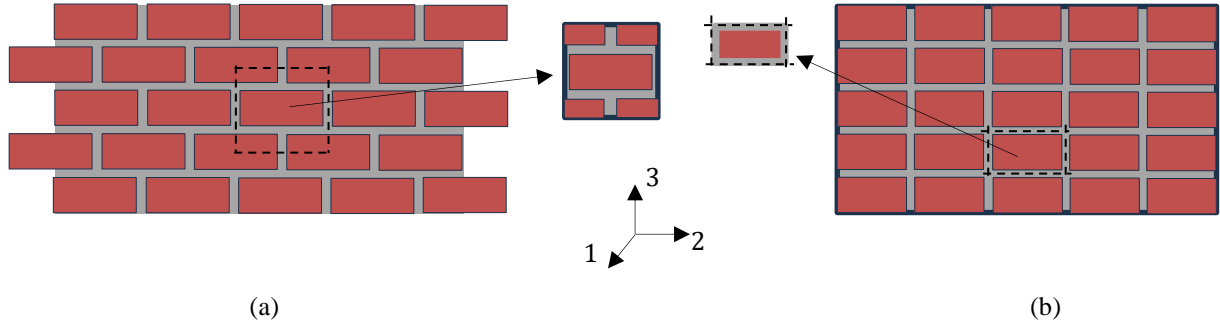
Arrangements of bricks in masonry: a) running bond; b) stack bond.
